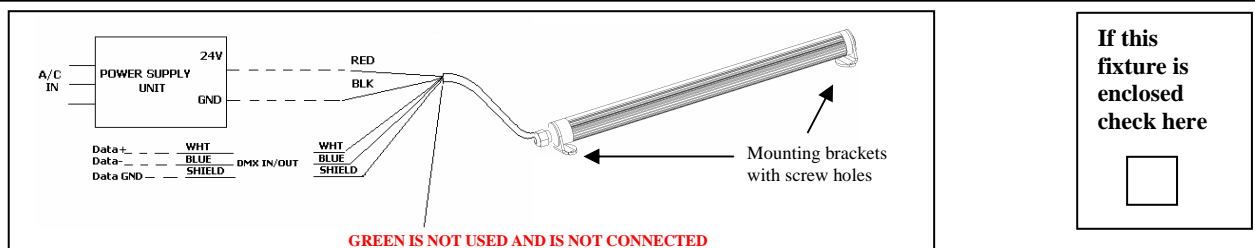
TRI COLOR (RGB) Dimmable LM Fixture
